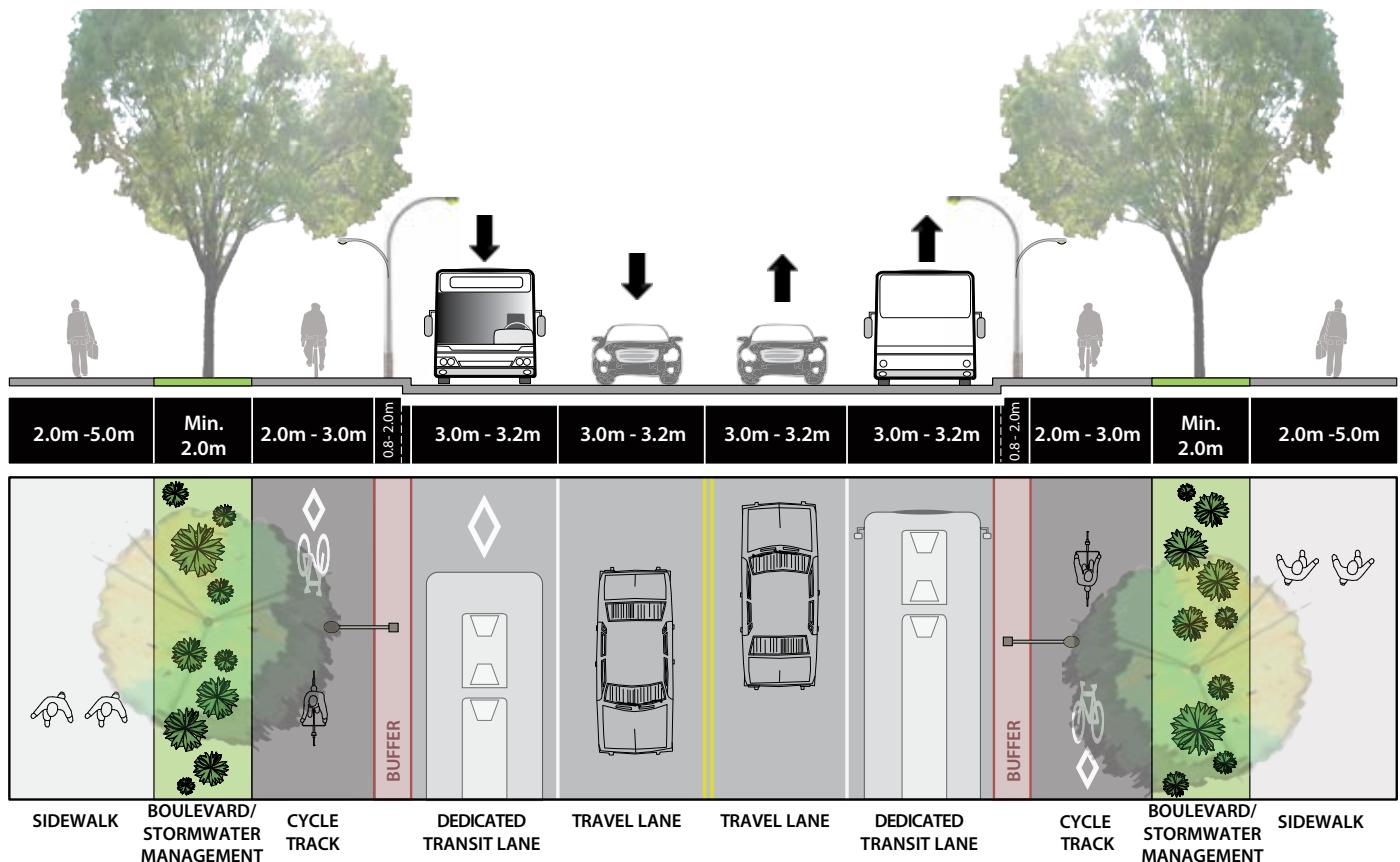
| Long-term Shelbourne Street Cross-Section with Dedicated Transit Lane
